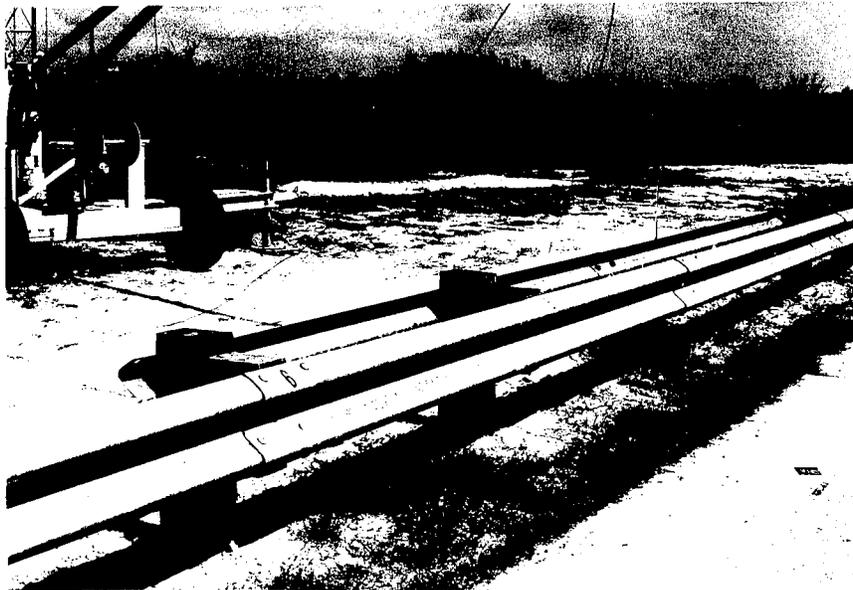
Washington nested W-beam wood-post guardrail with two posts over culvert and rear W-beam (before test 7147-4).
